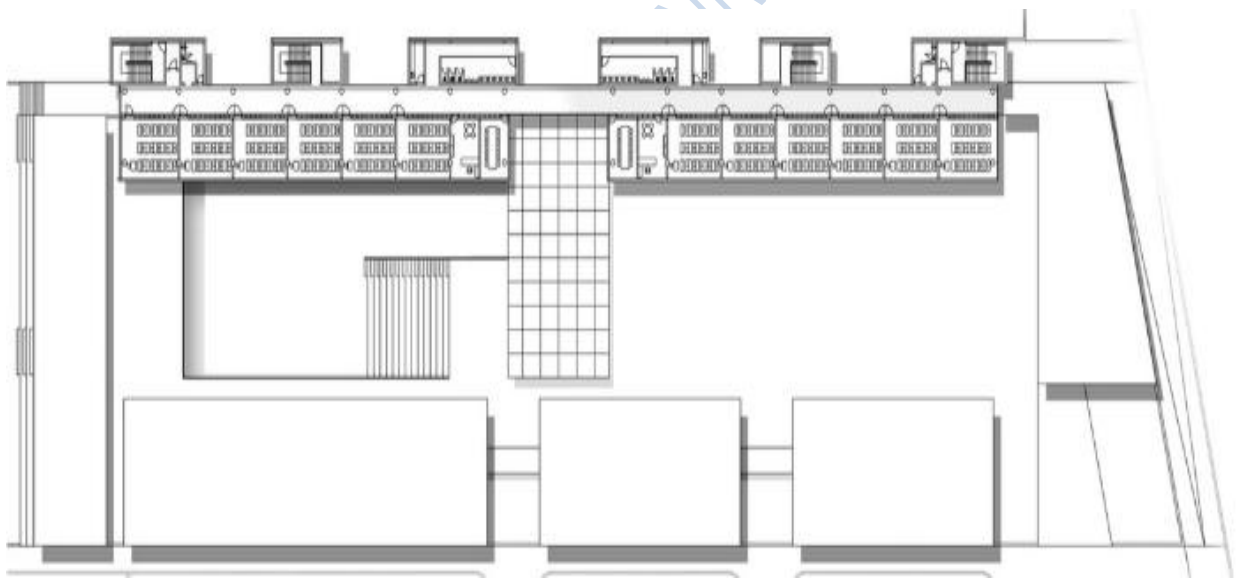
Third Floor Plan Source: archdaily.com (2022)
